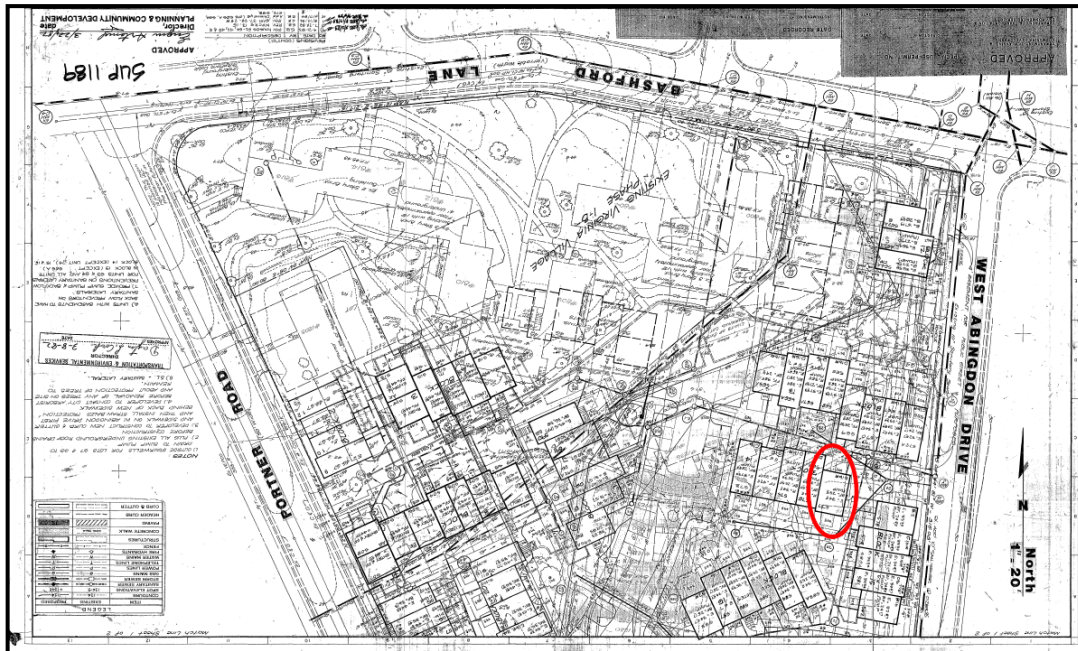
1982 Site Plan – Virginia Village with Location of Subject Building
